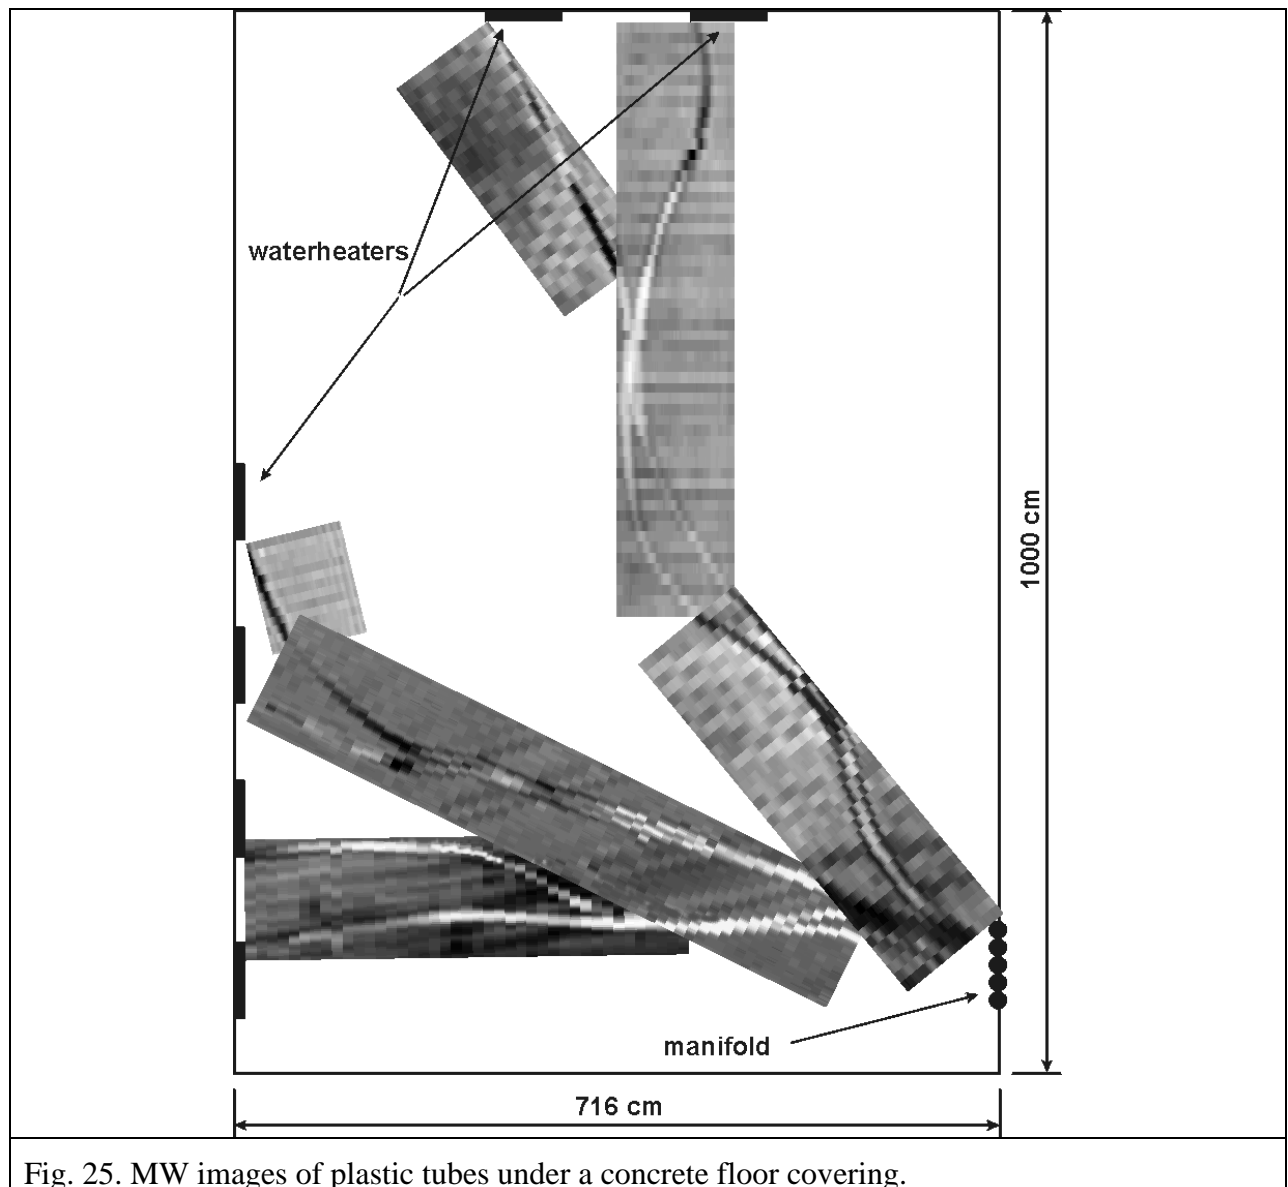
MW images of plastic tubes under a concrete floor covering.
